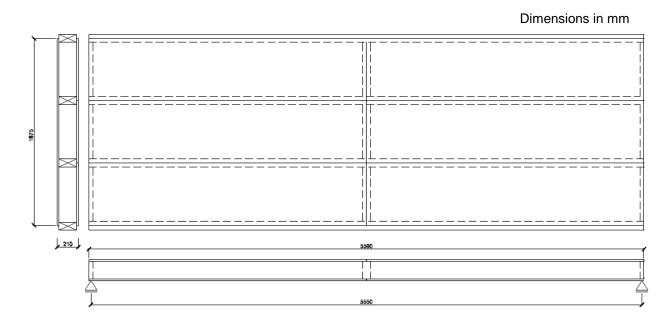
Racking resistance in floor and roof plain, alternative 1
